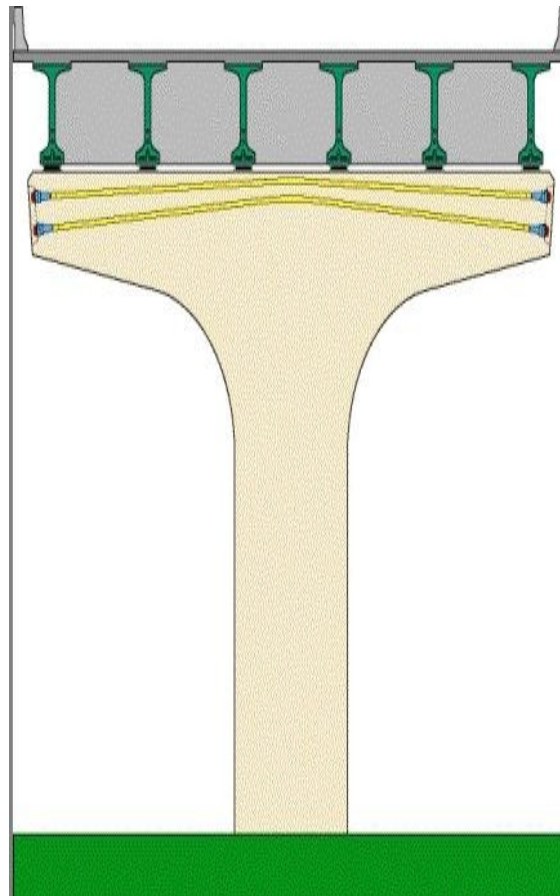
Post-Tensioning in Hammerhead Piers
